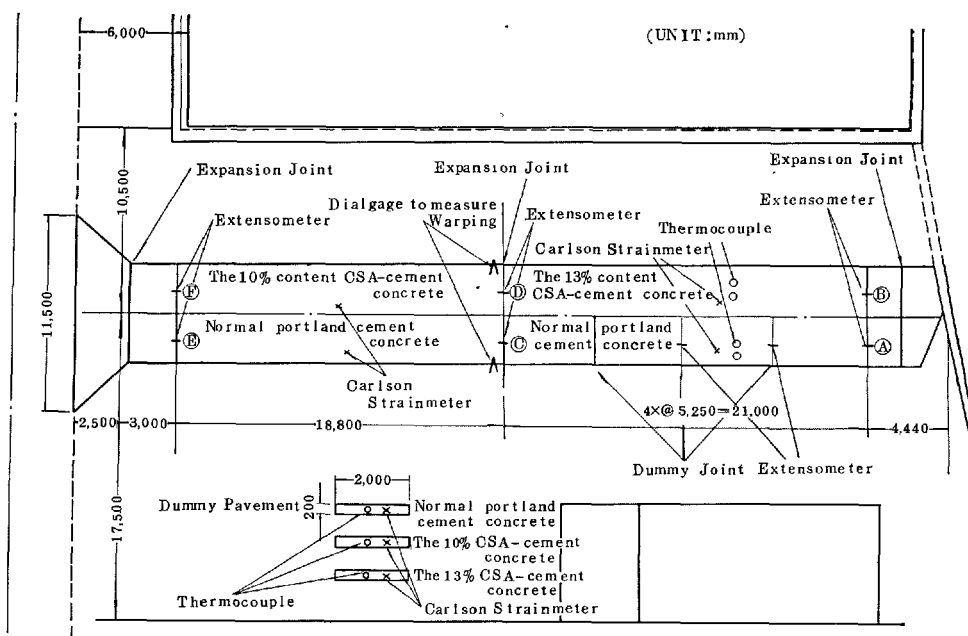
Plan of experimental paving and dummy paving (Unit: mm)
